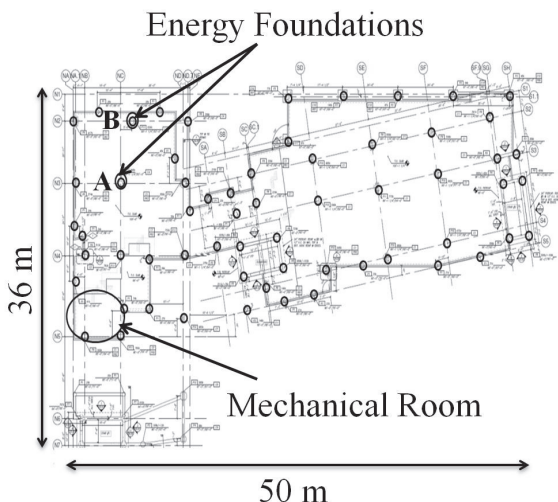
Plan view of foundation layout noting the energy foundation locations
